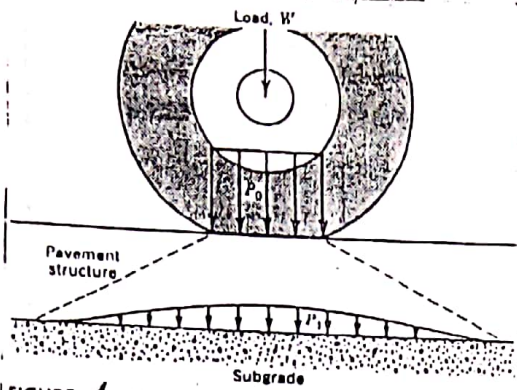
Spread of wheel load pressure through pavement structure. (Courtesy The Asphalt Institute.)
